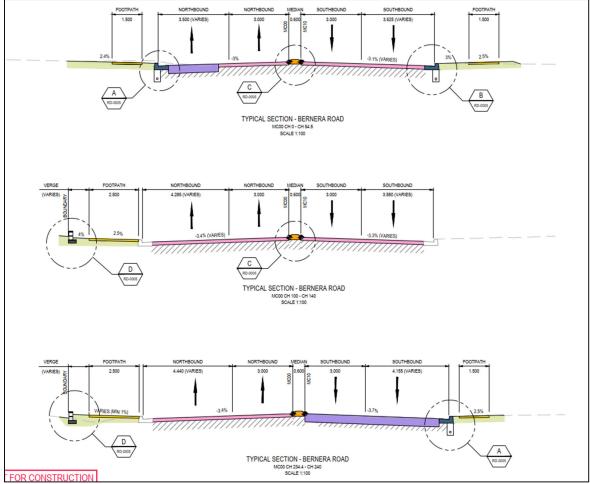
Proposed Typical Cross Sections – Stage 1 Bernera Road
